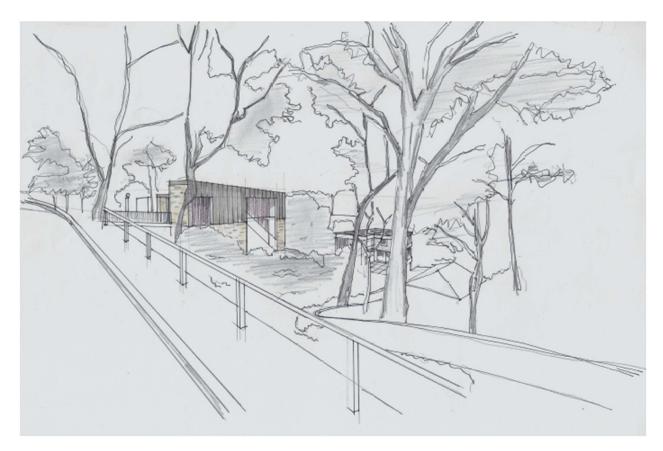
Sketch of the garage / studio from Amiens Road looking south west
